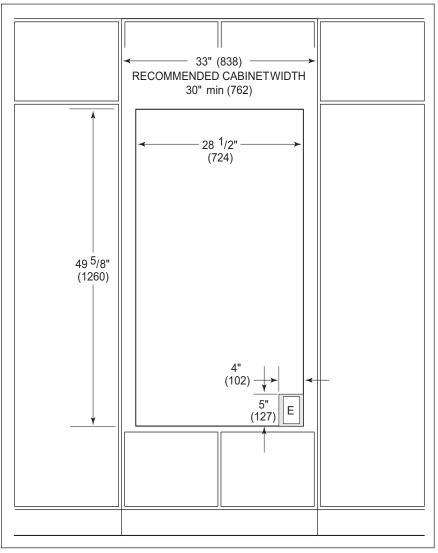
Front Cutout Dimensions and Electrical Placement
